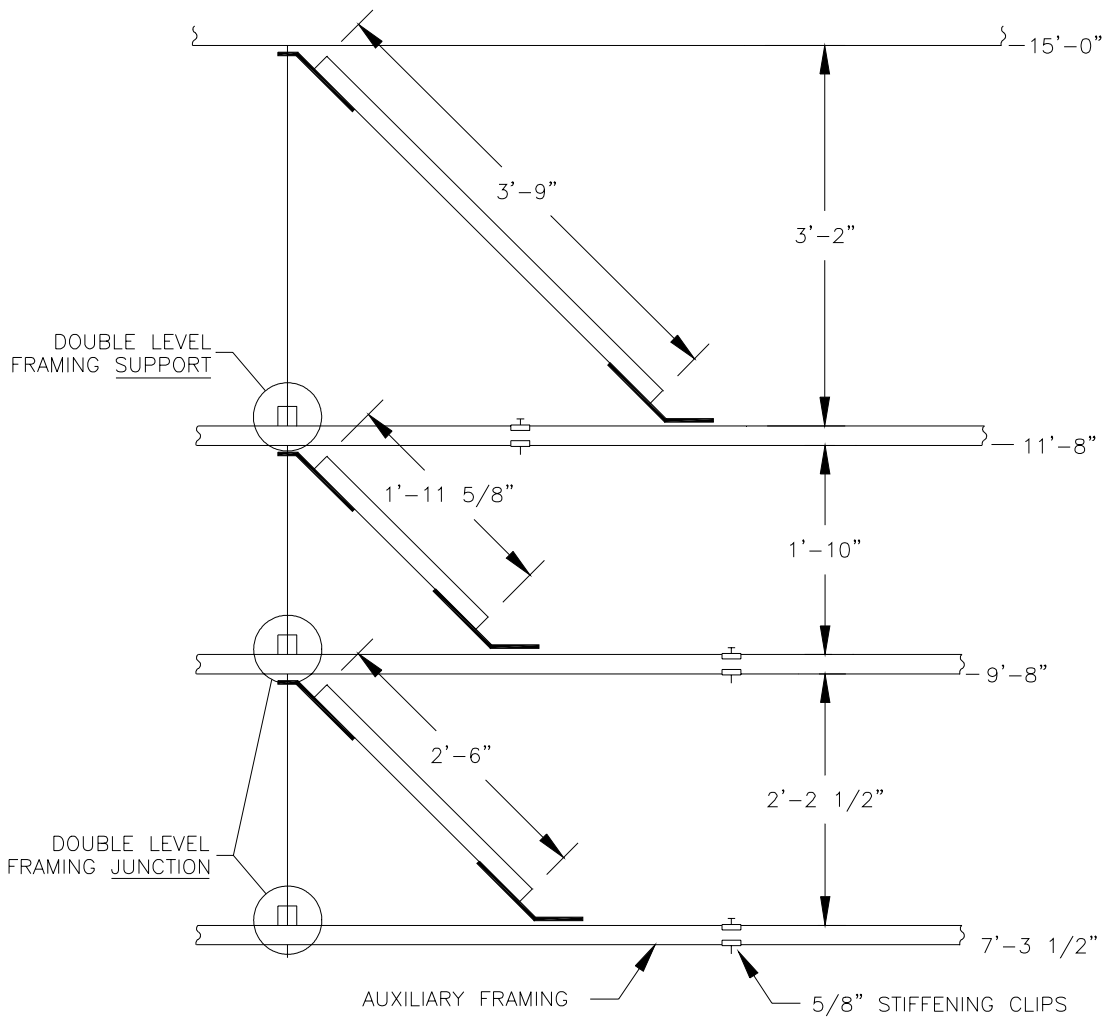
Typical Tri-Level Auxiliary Framing Arrangement - Newer Transport Areas
